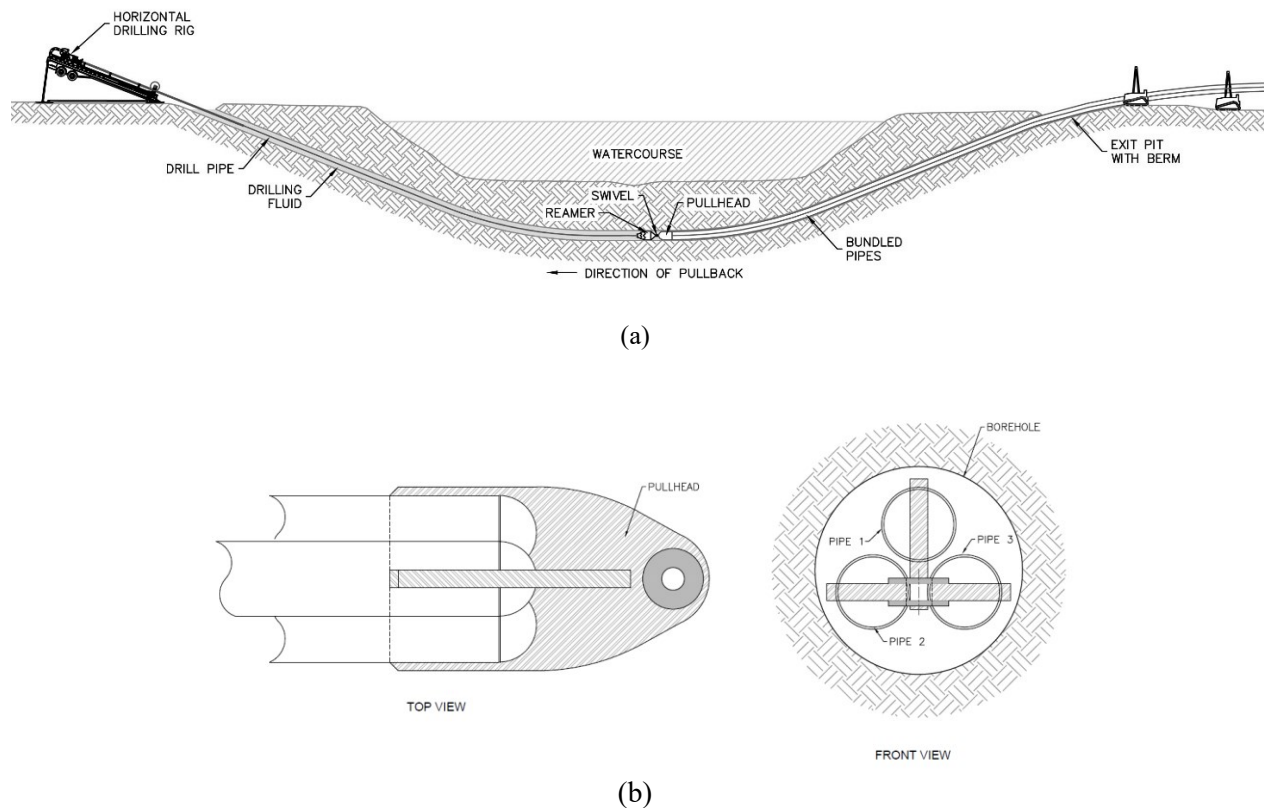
Schematic of a bundled three-pipe installation: (a) pullback process and (b) pullhead assembly.
